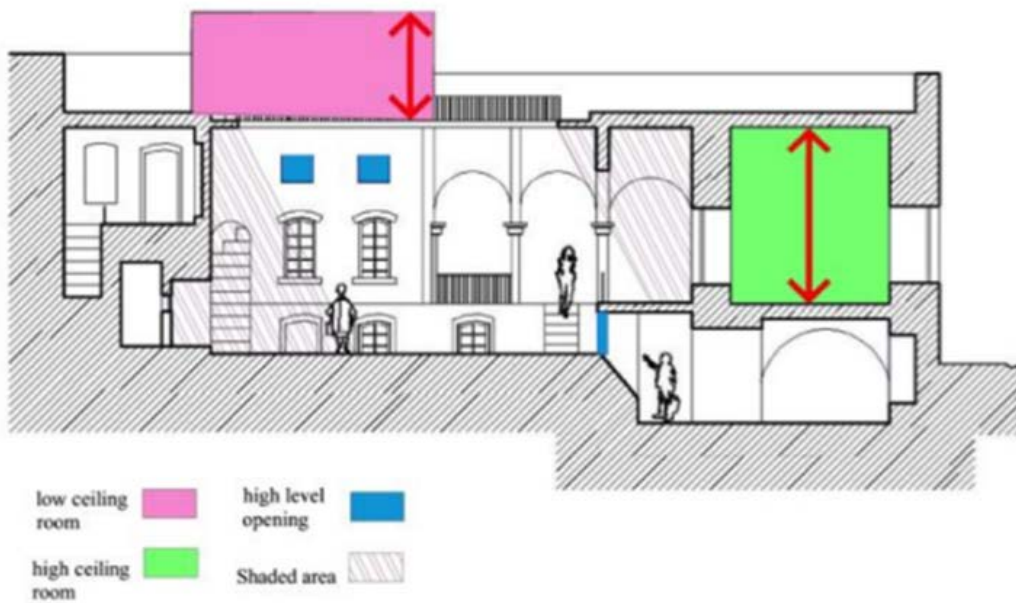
Cross section of houses in the castle with different ceiling height in winter and summer rooms
